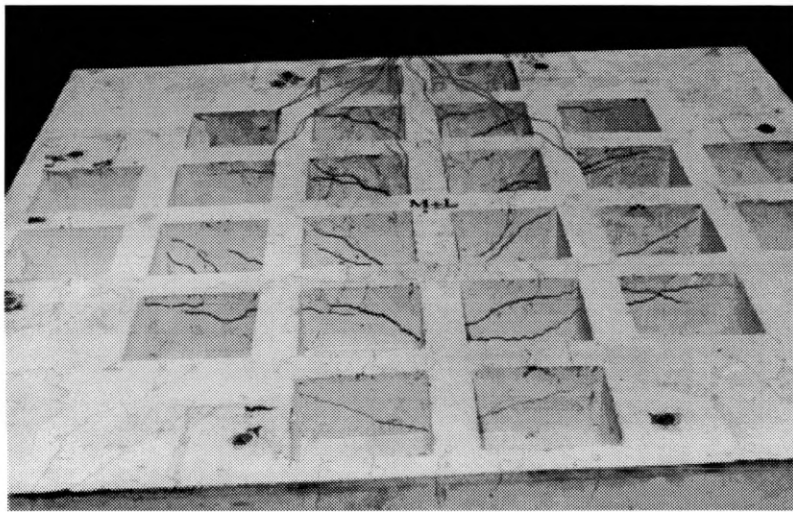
(h) Crack pattern after punching failure — slab No. 8
